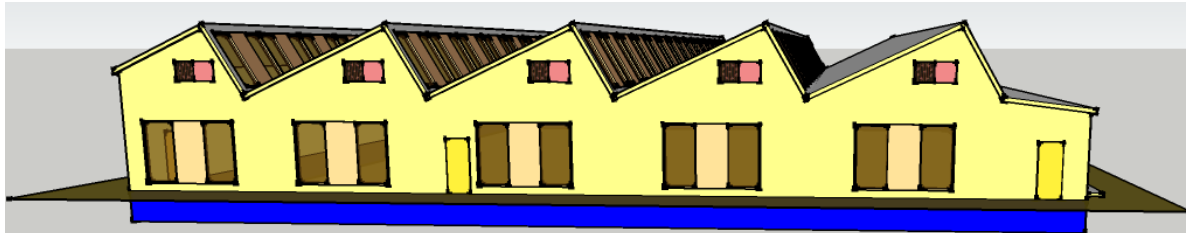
West elevation. A set of Generation 2 Shutters are on both the east and west facades. However, the fenestration in the roof could use swinging shutters if desired, choosing glazing to meet local climate trade offs between high solar heat gain coefficients and low heat transfer coefficients (U values) versus outside temperatures. The blue at the bottom indicates heavy perimeter insulation. The design envisions a heavily-insulated steel-framed pole barn.
